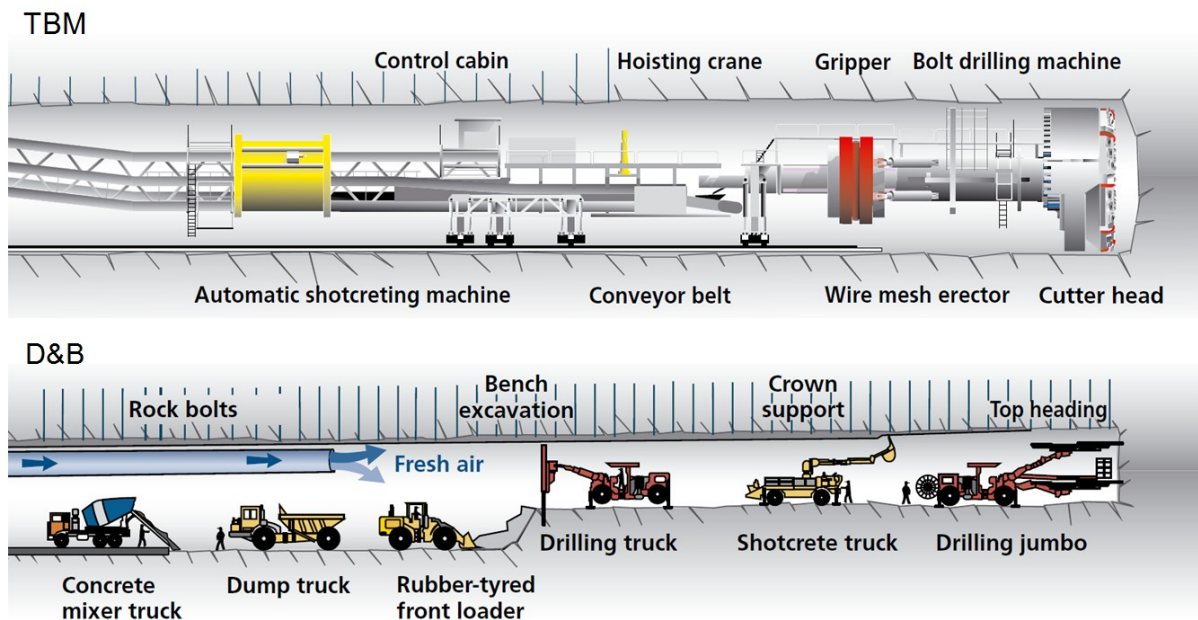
Underground tunnels can be constructed with tunnel boring machines (TBM), or by using the conventional drill and blast method (D&B).
